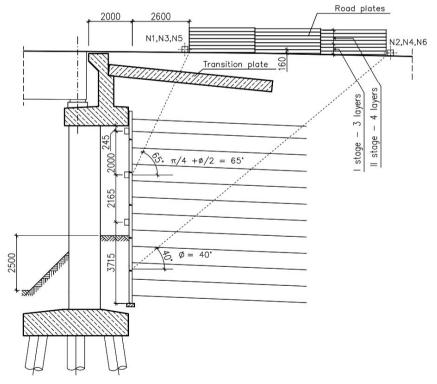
Arrangement of loading road plates – longitudinal view, scheme of load transfer to reinforced earth structure
